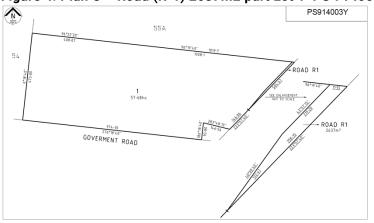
Plan C - Road (R-1) 2637m2 part Lot 1 PS 914003Y
